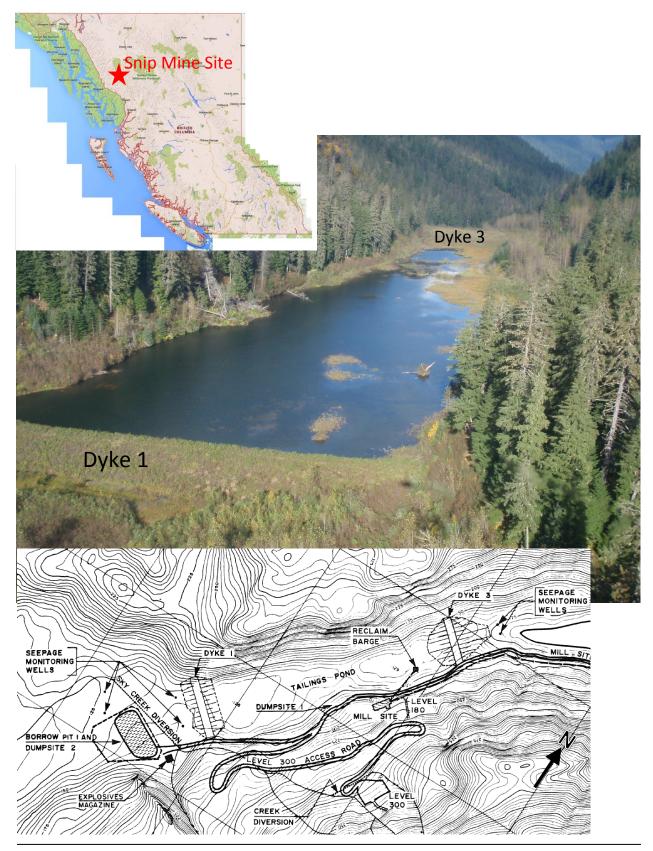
Snip Mine Site Location and General Layout of Closed Tailings Impoundment
